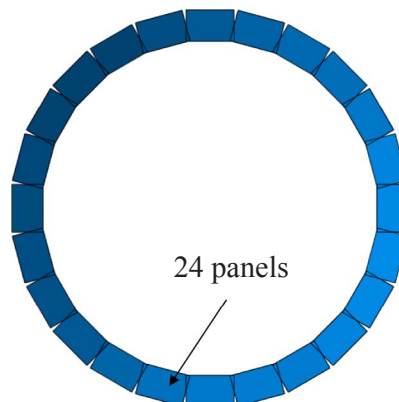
Plan view of the diaphragm wall with 24 panels.
